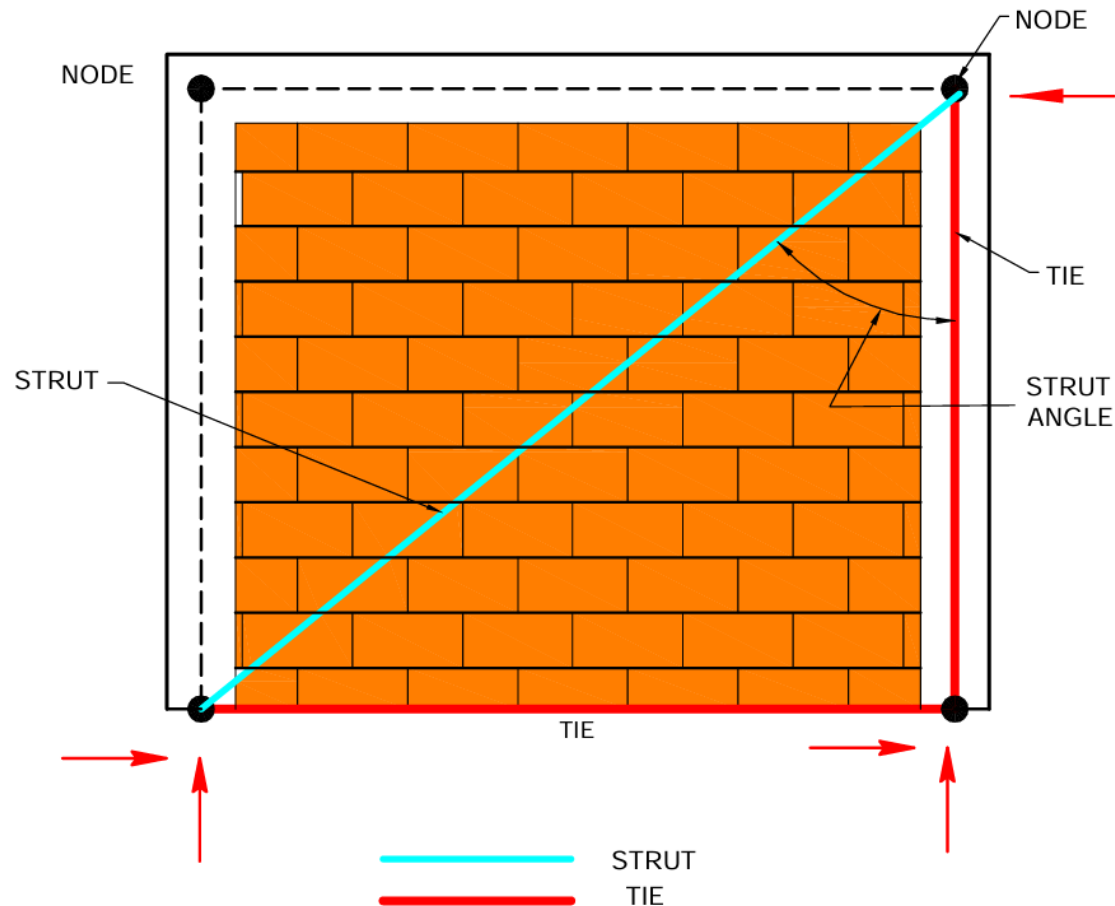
STRUT-AND-TIE MODEL OF CONFINED MASONRY WALLS
